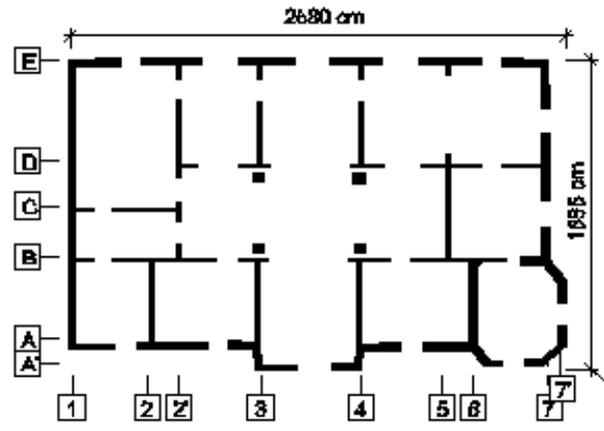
OTH. The 2<sup>nd</sup> main floor plan
